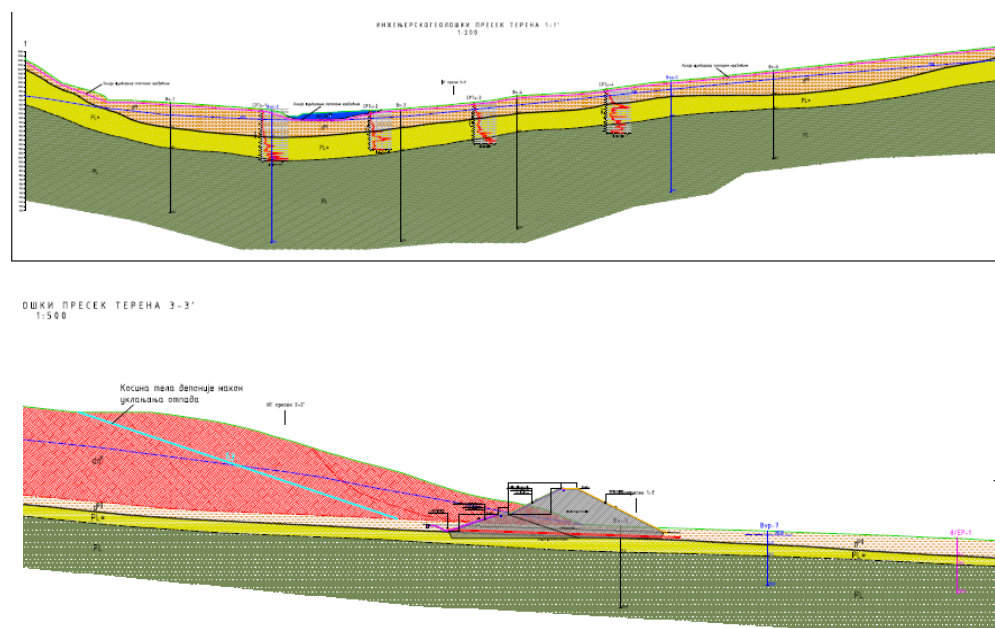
Position of piezometer wells, cross-section, Study on geotechnical conditions for the design and construction needs of the Supporting building in the municipal waste landfill complex at Vinča, Hidrozavod DTD Novi Sad, 2018.
